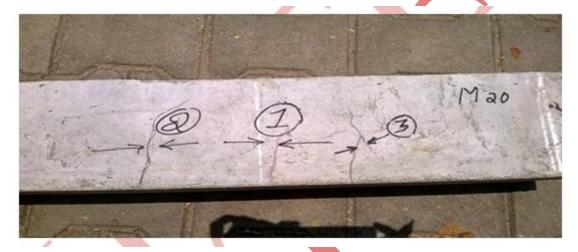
Cracking Pattern for the M<sub>20</sub> Grade Concrete
